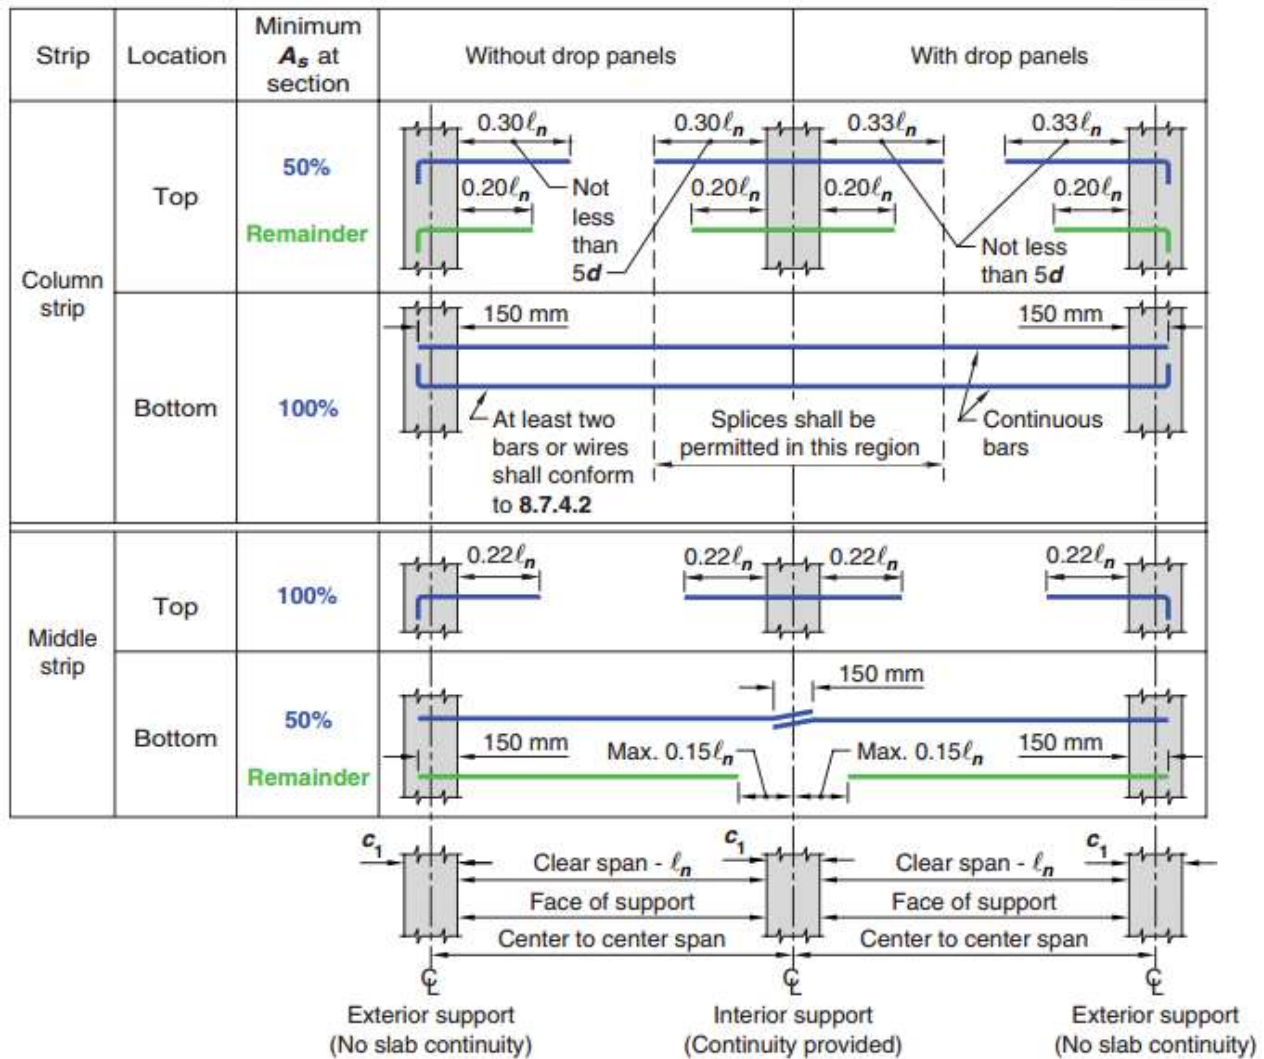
Minimum extensions for deformed reinforcement in two-way slabs without beams.
